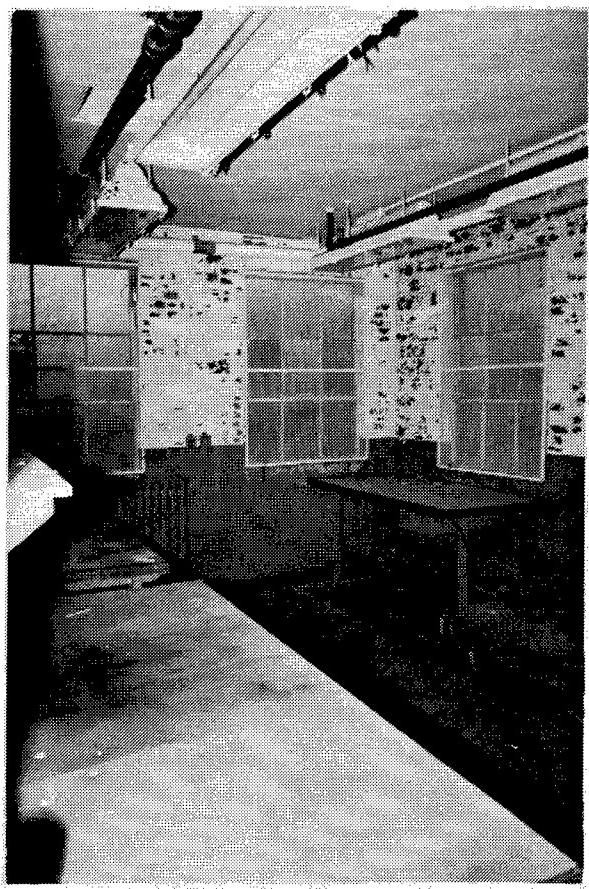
Building PE-16: Interior view of this Metal Parts Loading Building.
